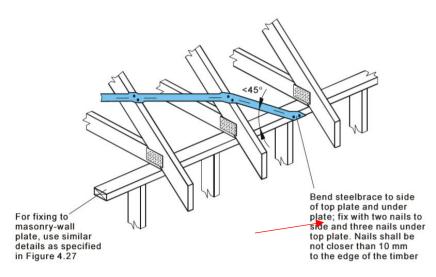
END FIXING DETAILS AT HEEL—TO TOP PLATE
